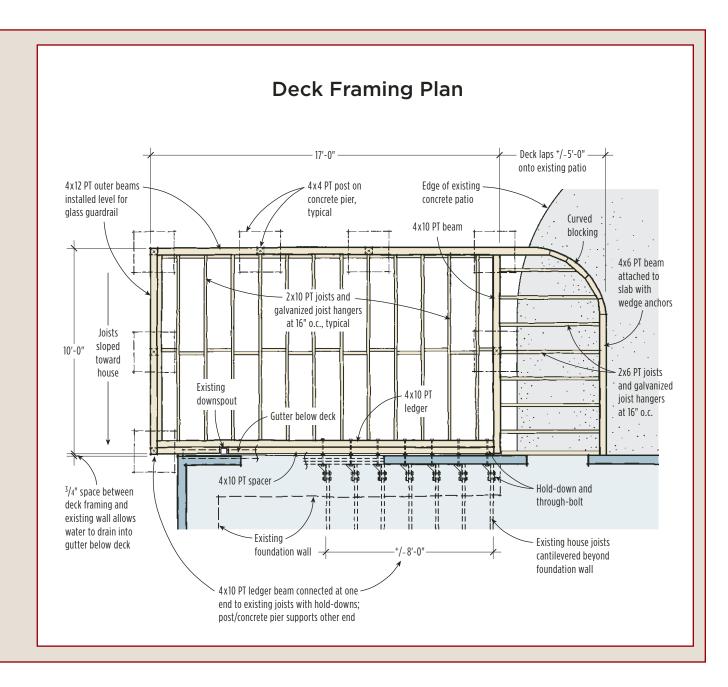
The joists run between a 4x10 ledger beam and a 4x12 outer beam carried by posts on concrete piers (above). One end of the deck laps about 5 feet onto an existing concrete patio (left and opposite).
